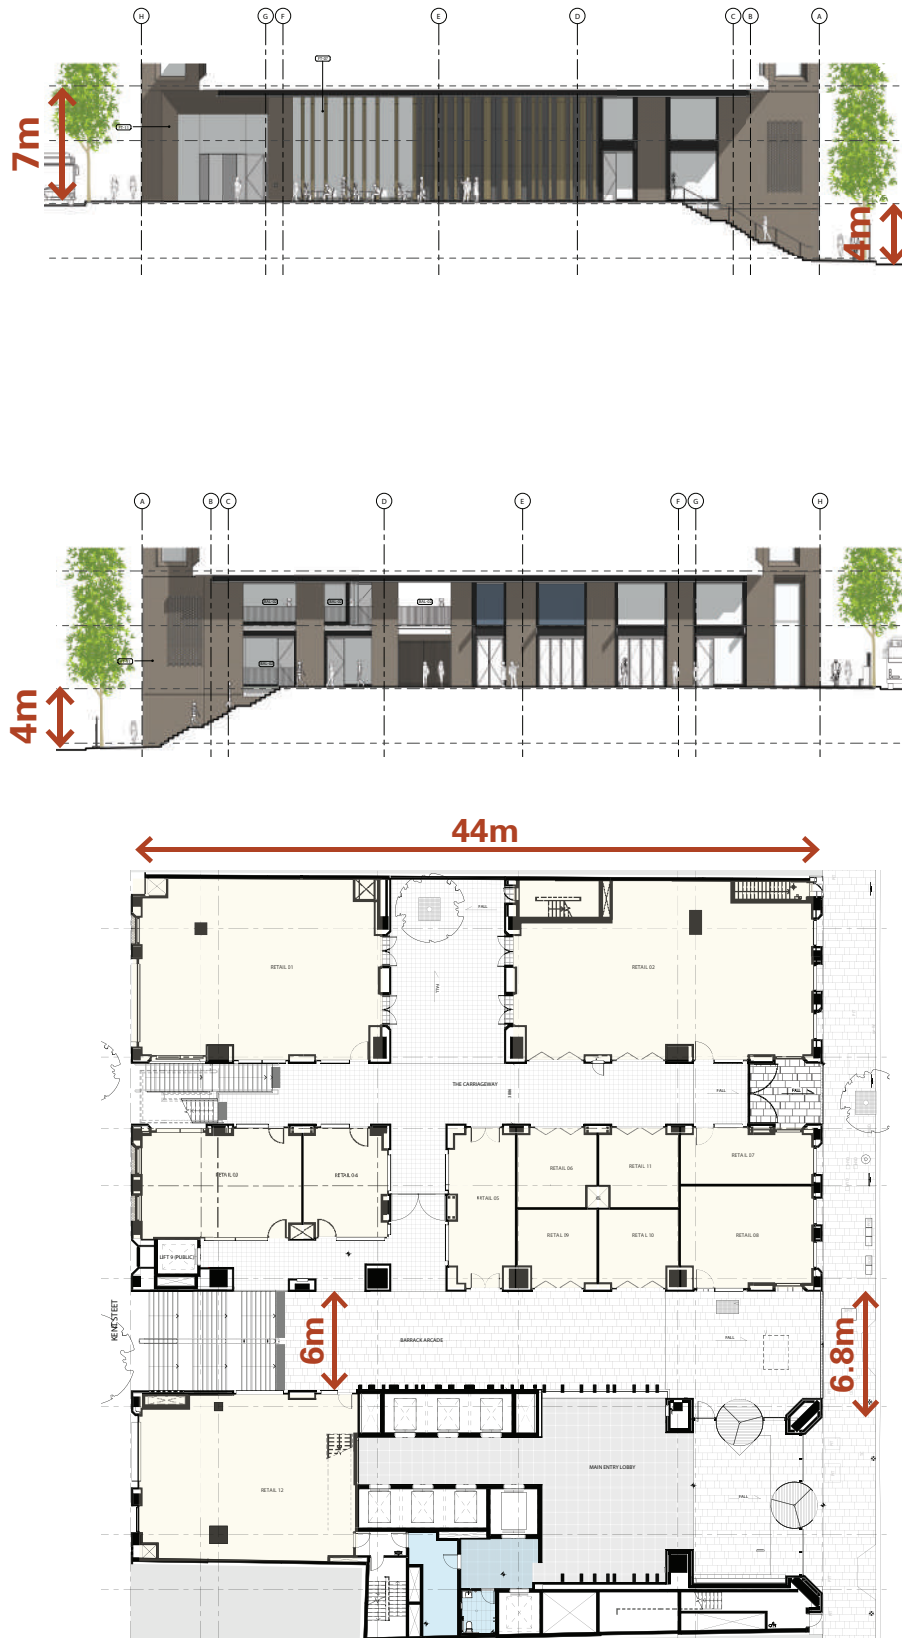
Barrack Place indicative Plan and Sections with key dimensions for comparison
